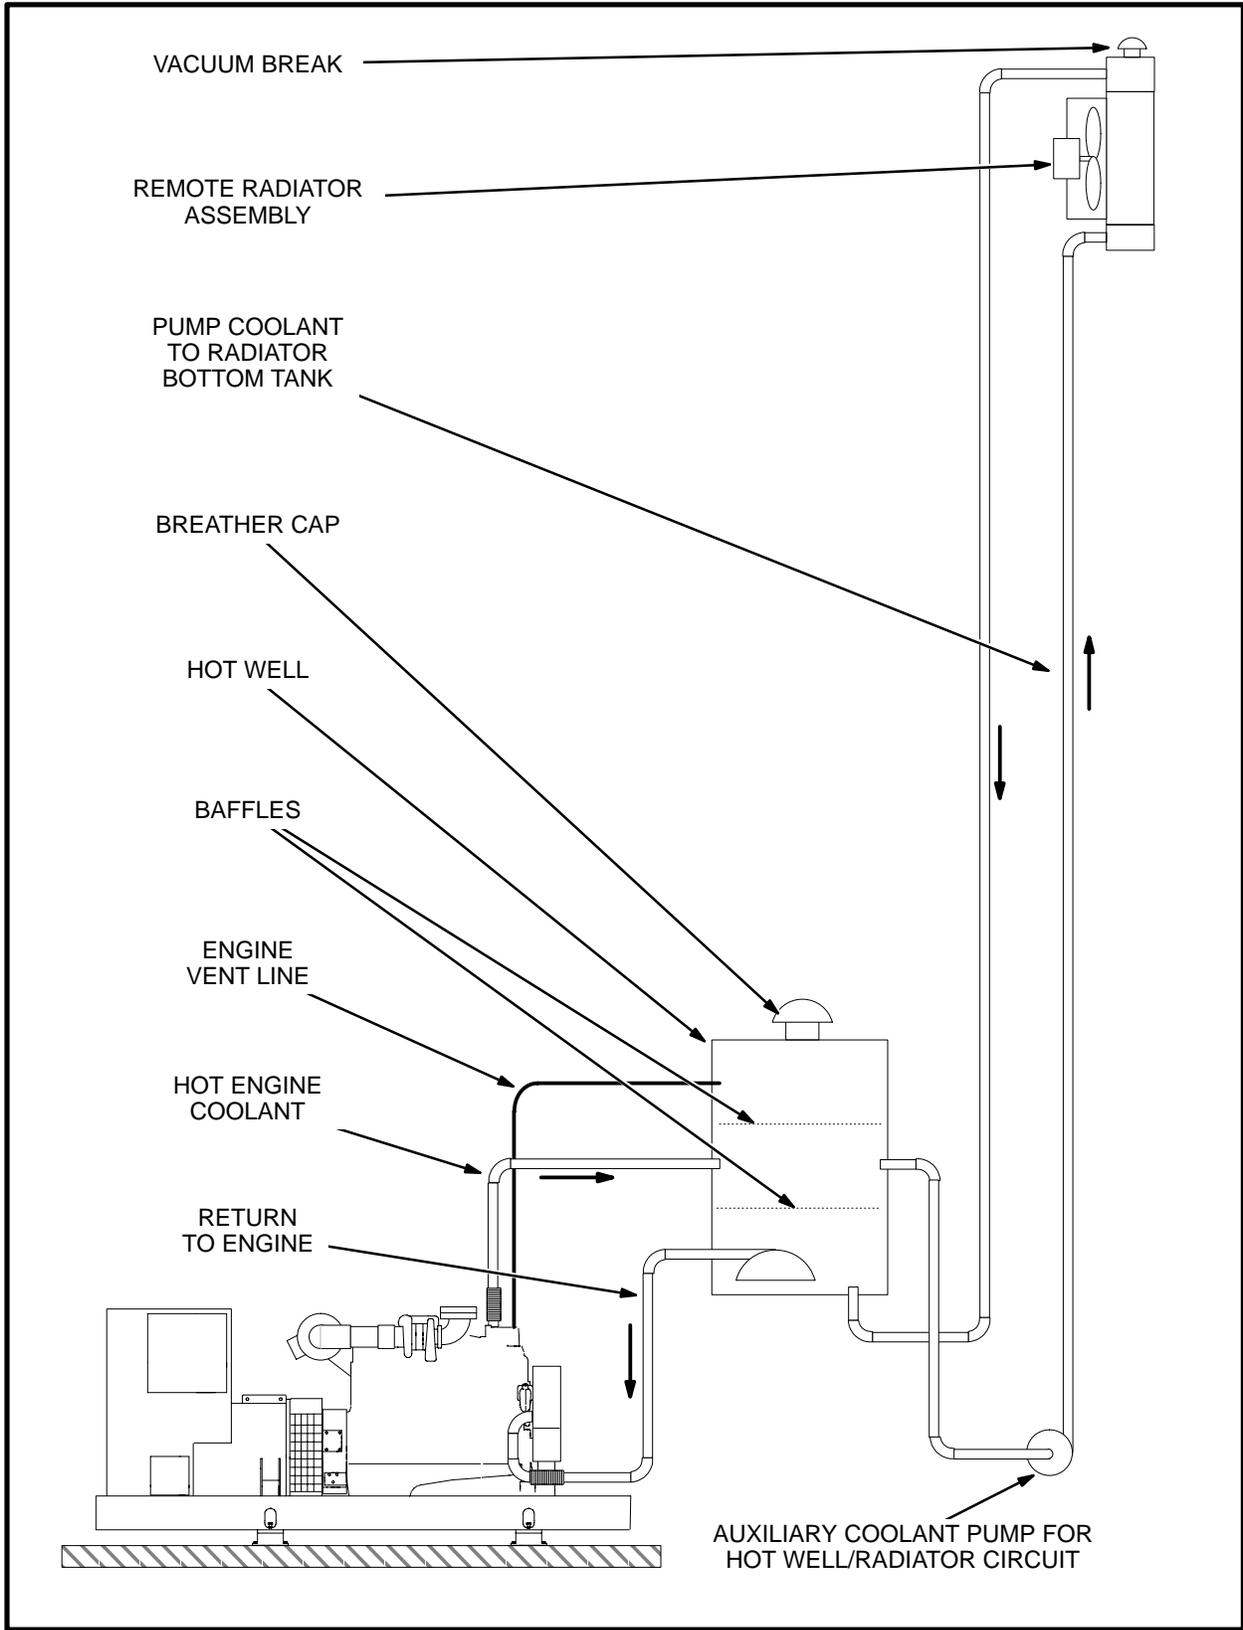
Remote Radiator With Hot Well and Auxiliary Coolant Pump
